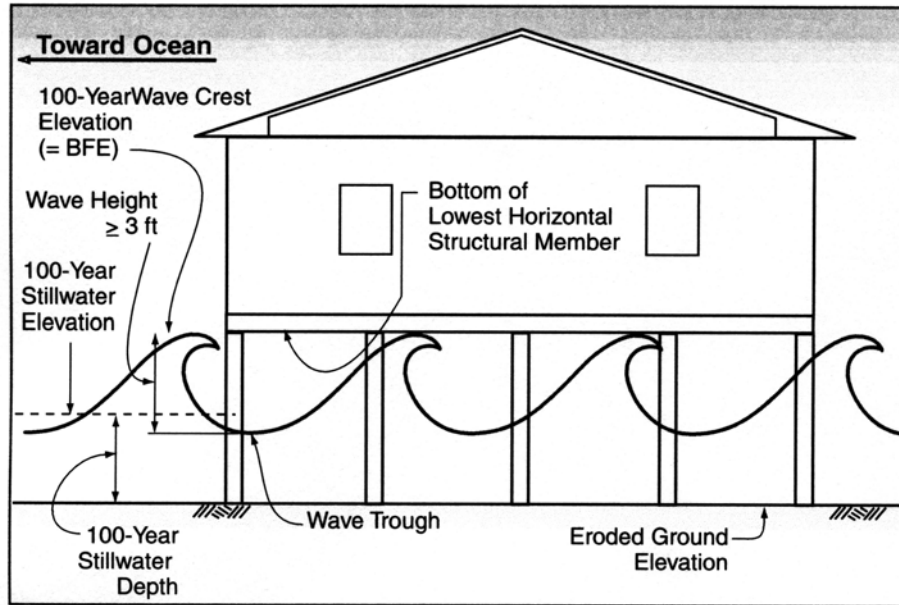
Minimum NFIP standards applied to New Jersey coastal dwellings in the V-zone require that buildings be elevated on an open foundation so that the lowest horizontal structural member is above the Base Flood Elevation. Reprinted with permission from the FEMA Coastal Construction Manual (FEMA, 2000).
